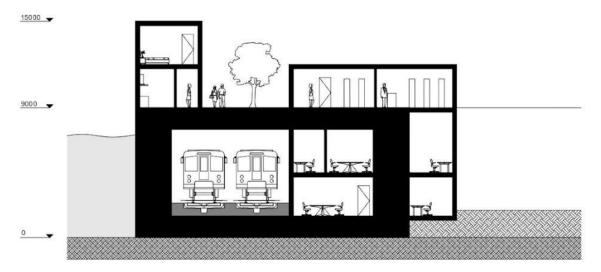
Section 2: metro line inside the dam, buildings on top, partially inside and over the dam, building connection to the island (Buis et al., 2021).
